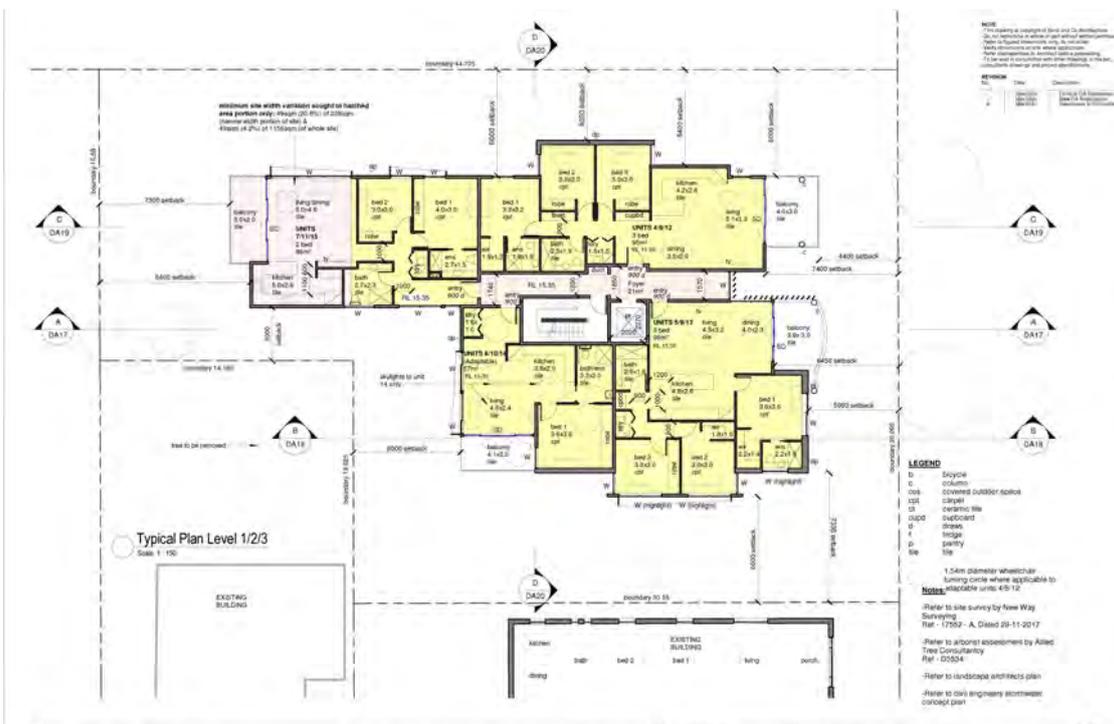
Typical Plans Levels 2/3/4 - Proposed (Source: Borst & Co Architecture)
